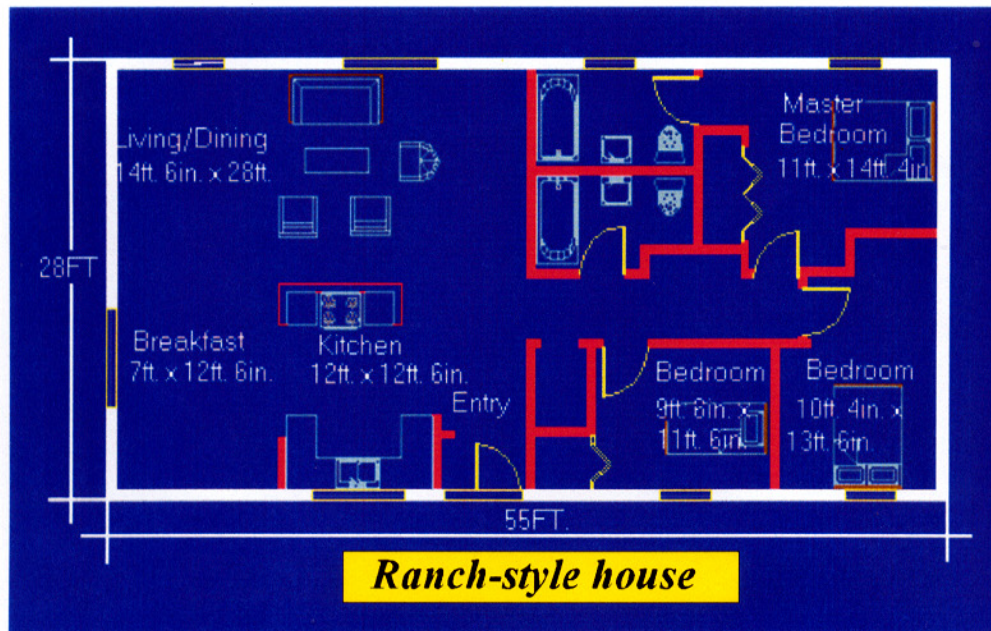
Floor plan of one-story ranch-style house used in thermal modeling.
